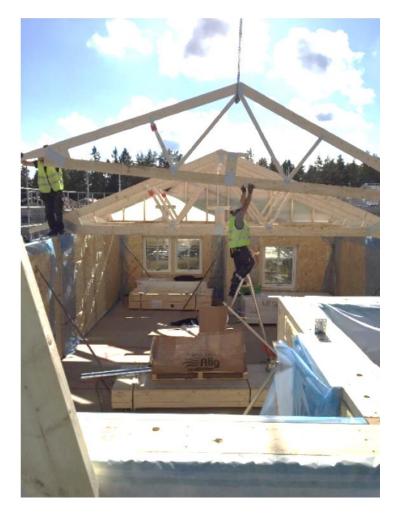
Derome roof truss lifted into position on site (image courtesy of Derome)
